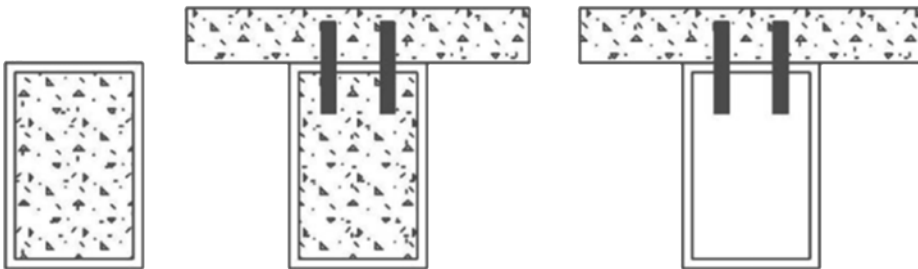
Concrete-filled FRP tubes with a concrete slab on top [11]
